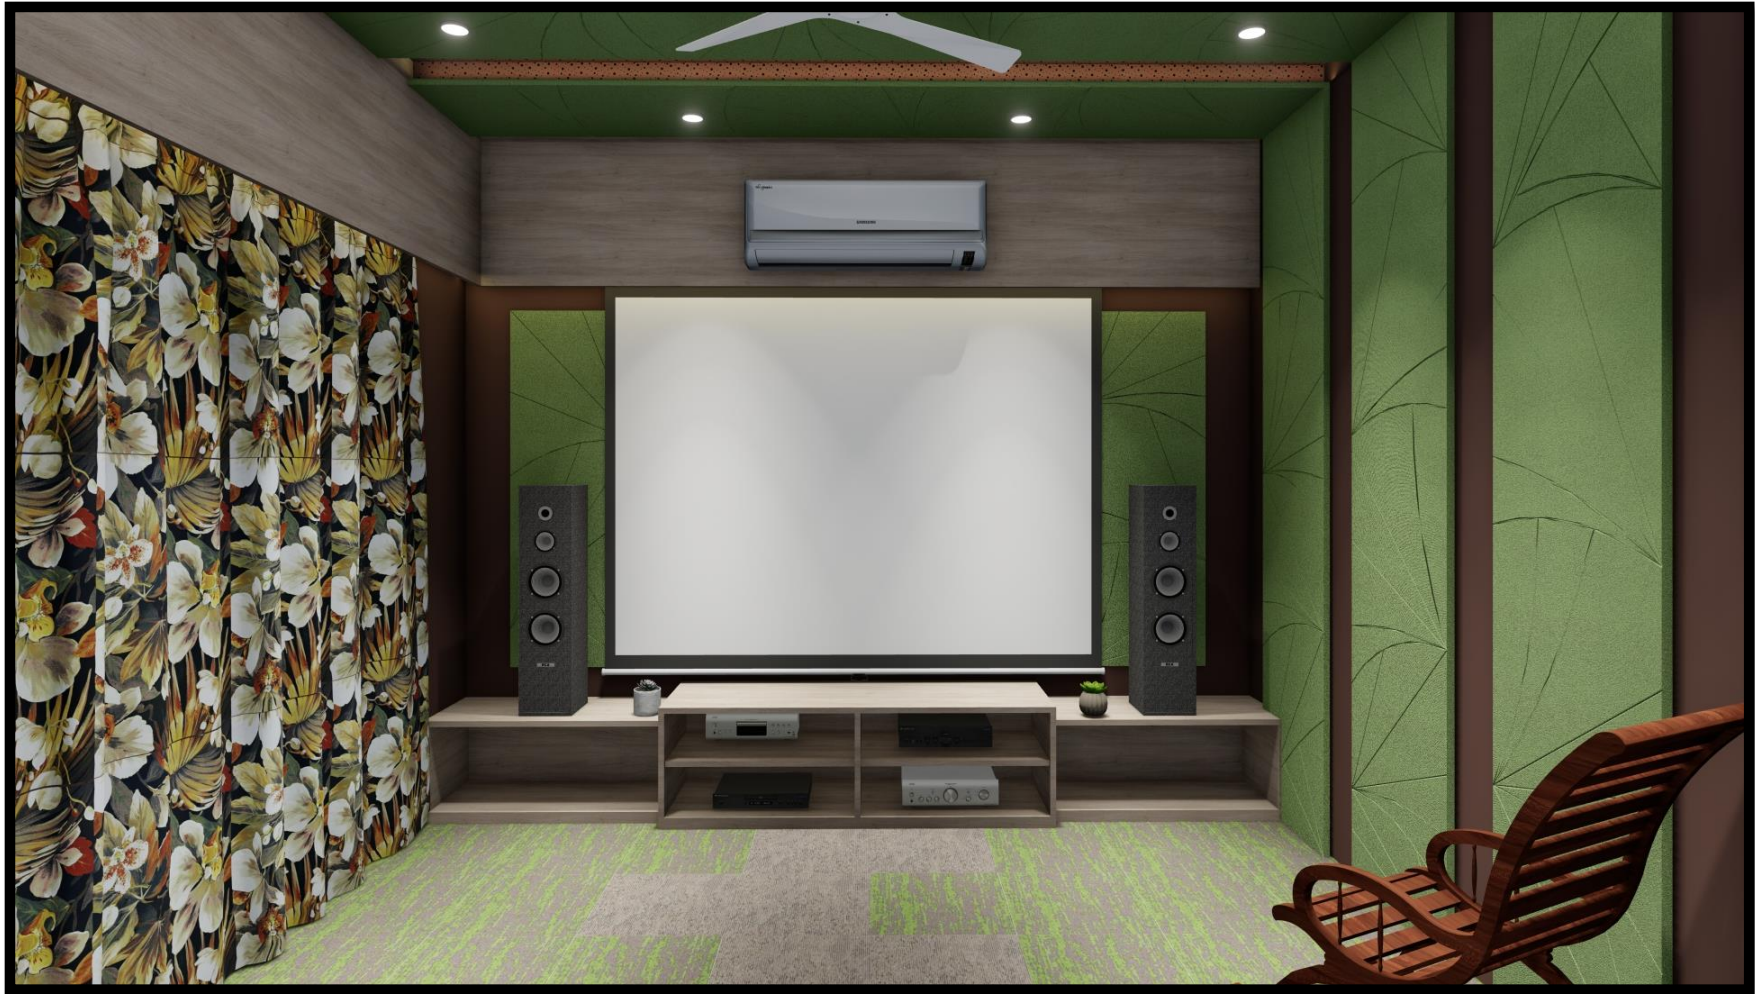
3D View of Proposed Wall “AB” of Theatre Room
